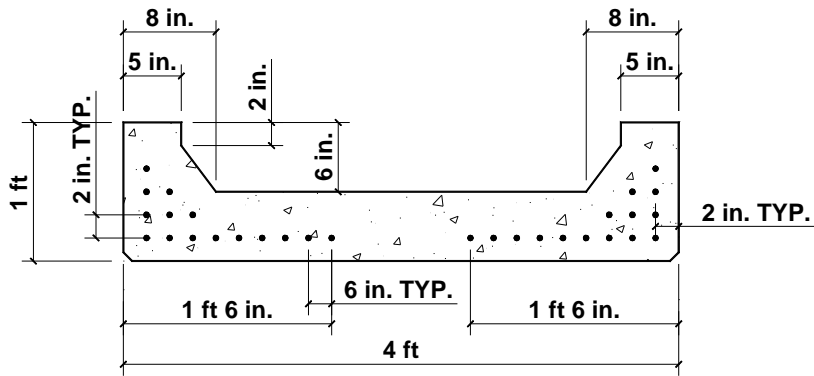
Cross-section of box girders used for strand-pullout tests
